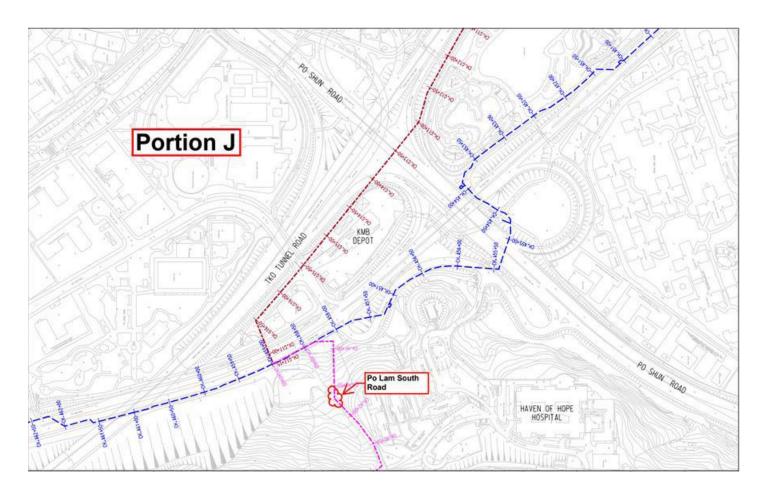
Location Plan for Portion J - Mau Wu Tsai 1 (Po Lam South Road 1)
